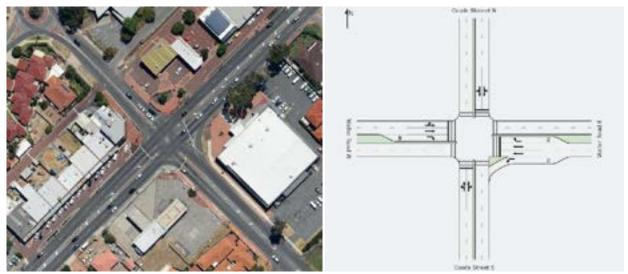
Walter Road/Coode Street Intersection – Existing Geometry
